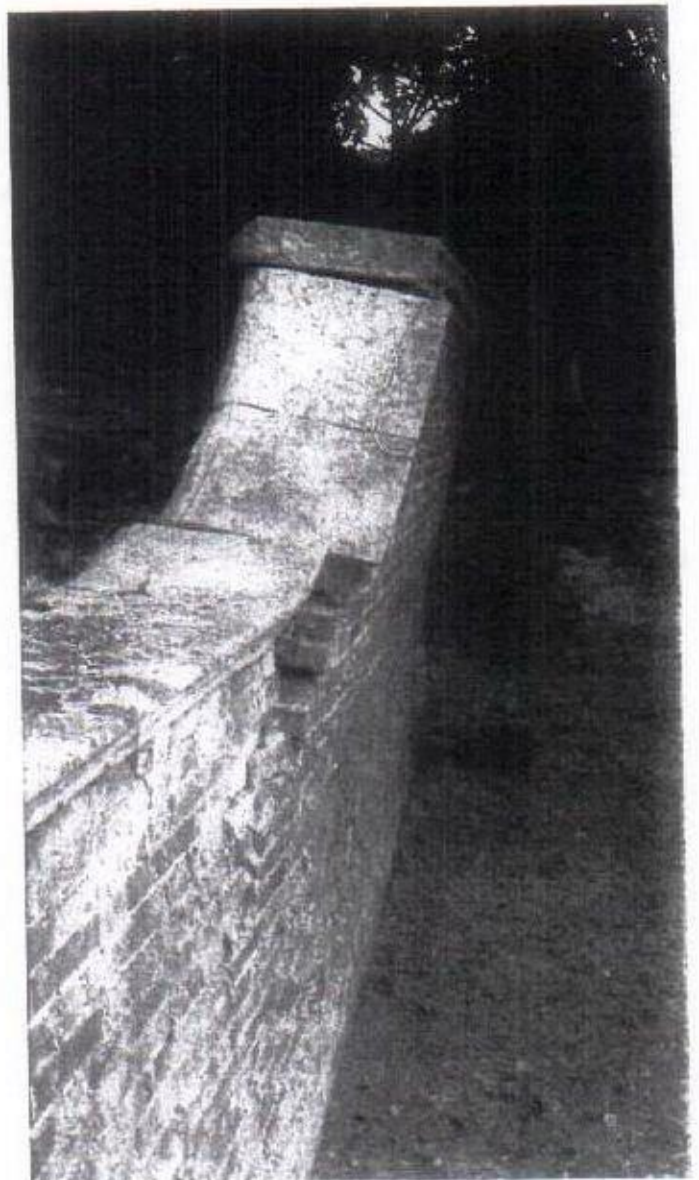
ITALIAN TERRACED GRADEN TOP HEAD WALL 18
